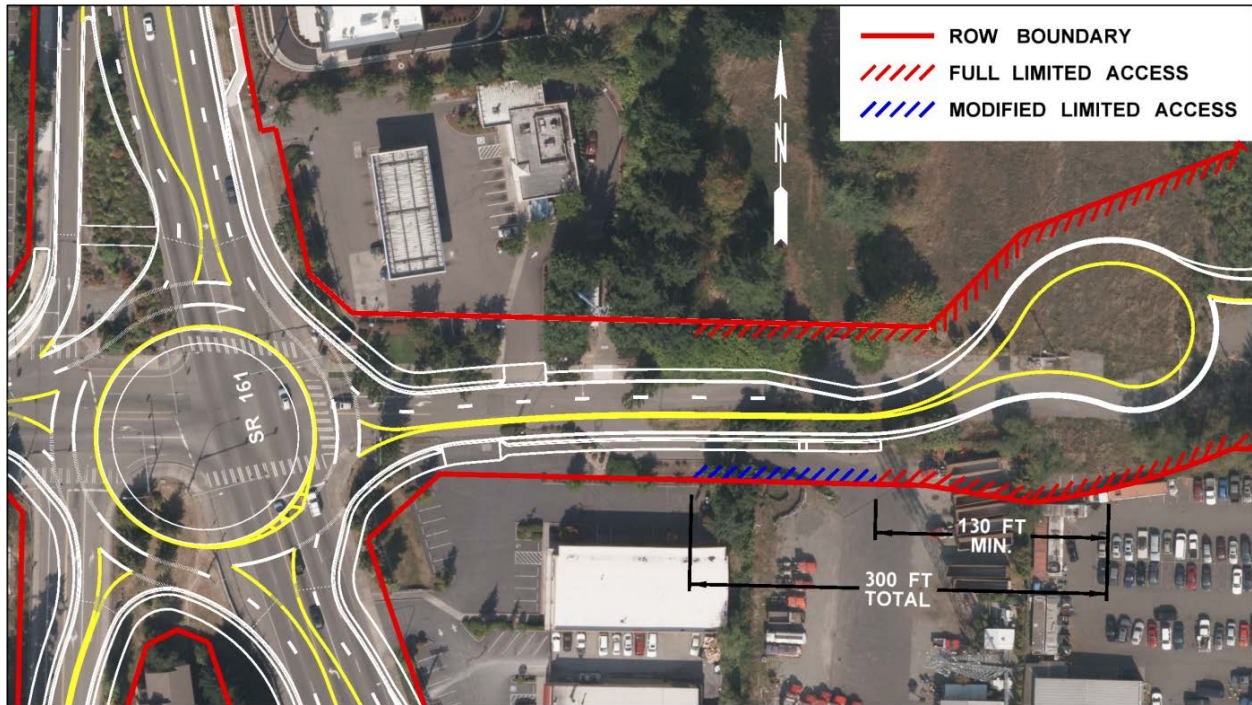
Proposed Modified Limited Access on the I-5 Southbound Off-Ramp to S 356th Street/SR 161
